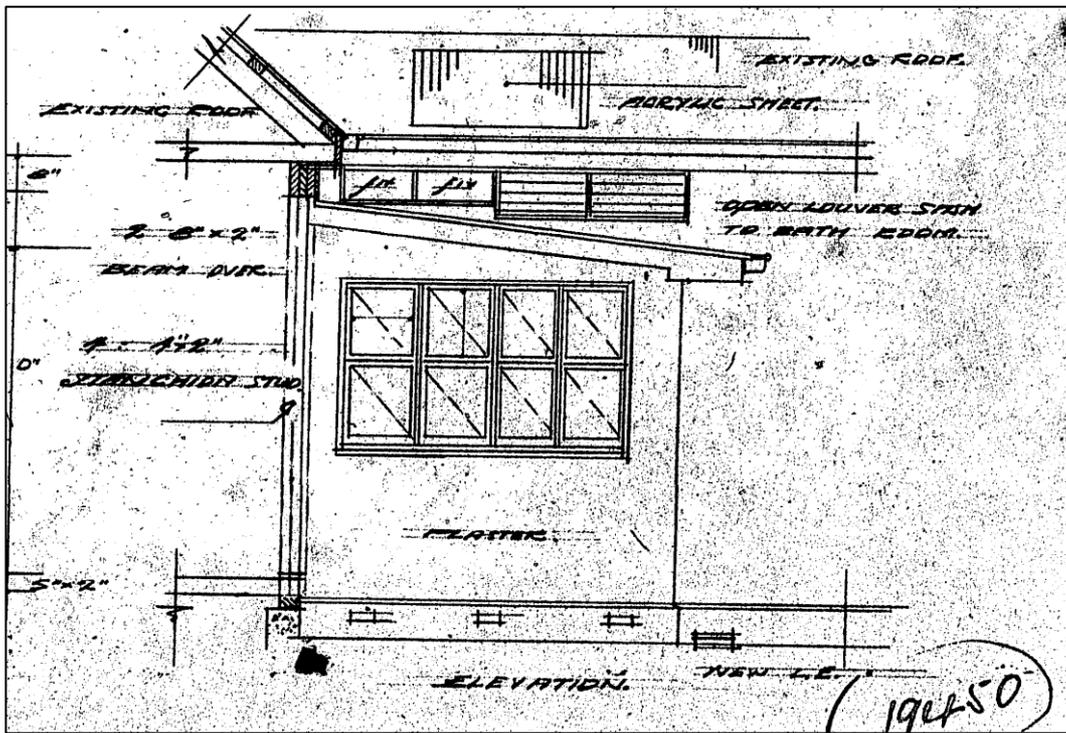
Detail from the 1956 plans showing the proposed north elevation (Building Plans, DCC Archives).
